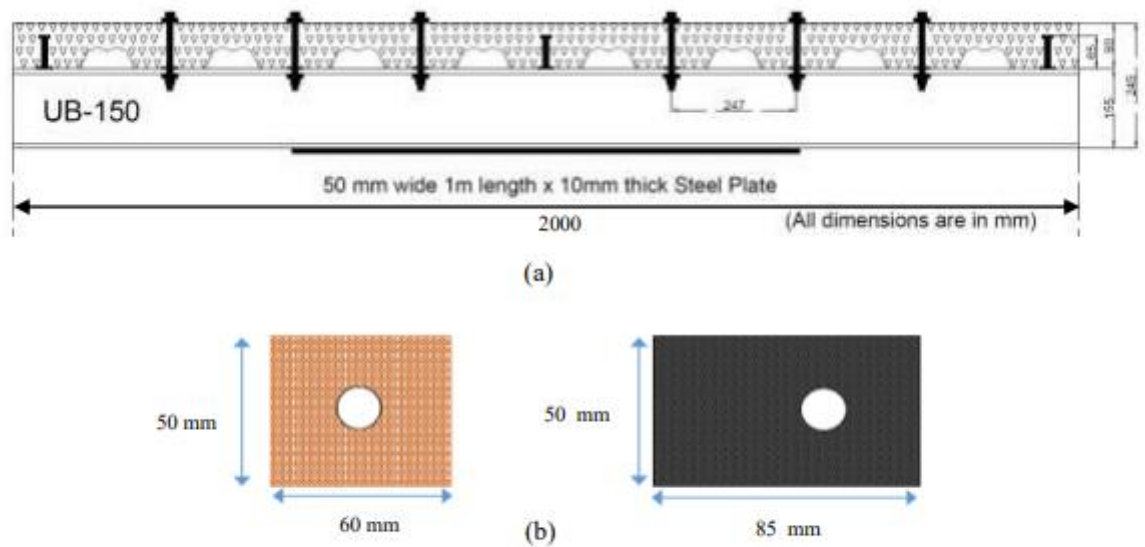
(a) Strengthening of Beam 5 and (b) Steel plates used for anchoring of steel bolts in Beam 5 and 6
